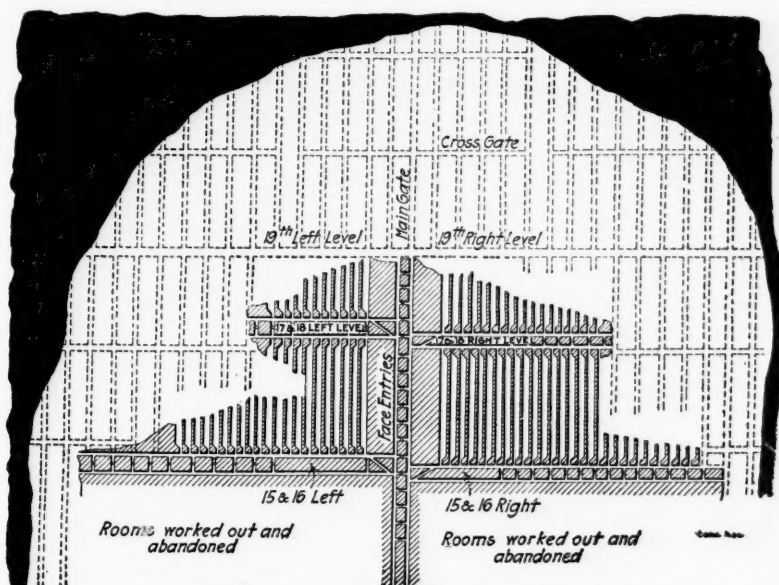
STARTING LONGWALL FROM ROOM-AND-PILLAR WORKINGS
